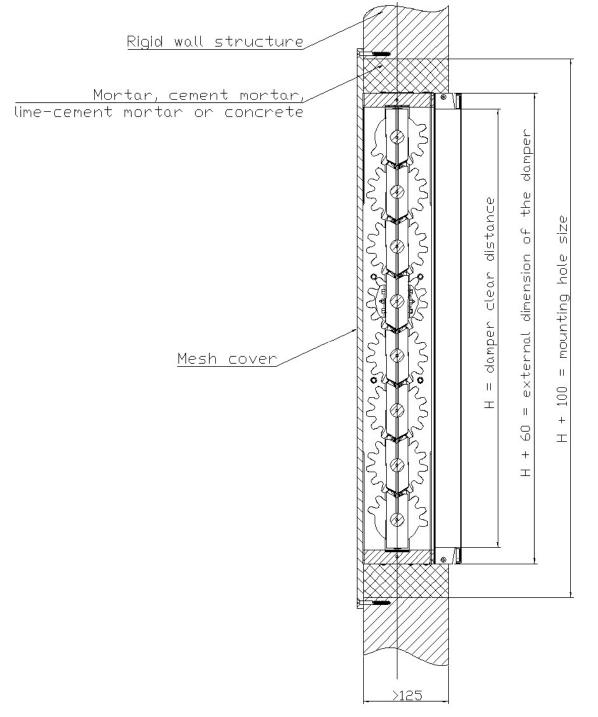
Installation method of fire dampers WKP-P in structures thicker than 125 mm
